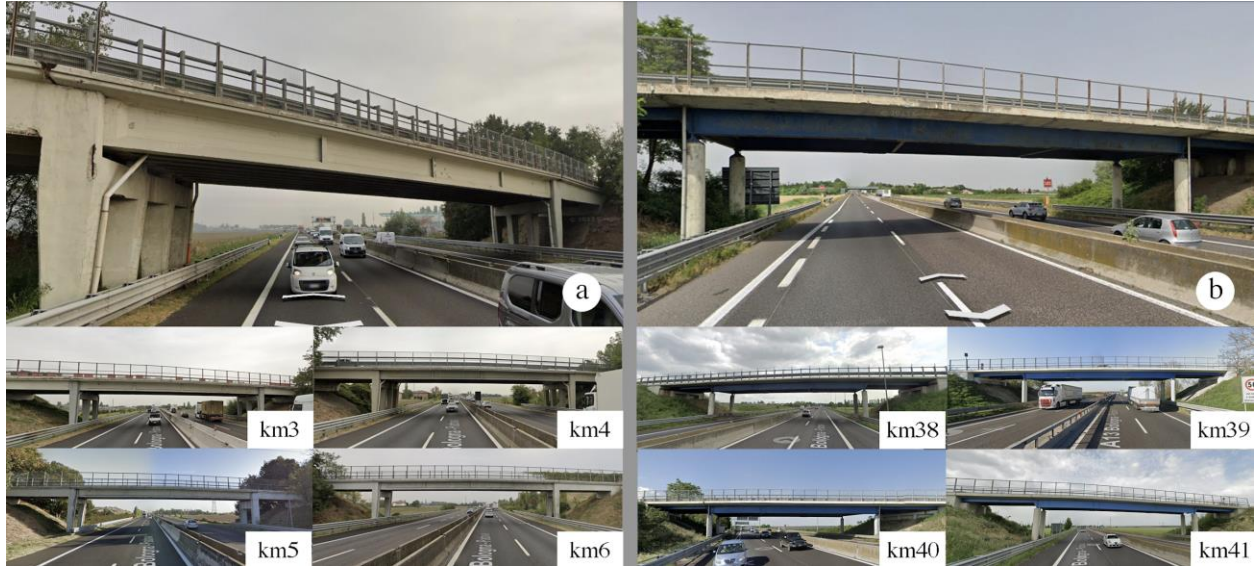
Two examples of bridge populations: (a) prestressed reinforced concrete bridges, (b) steel-concrete composite bridges
